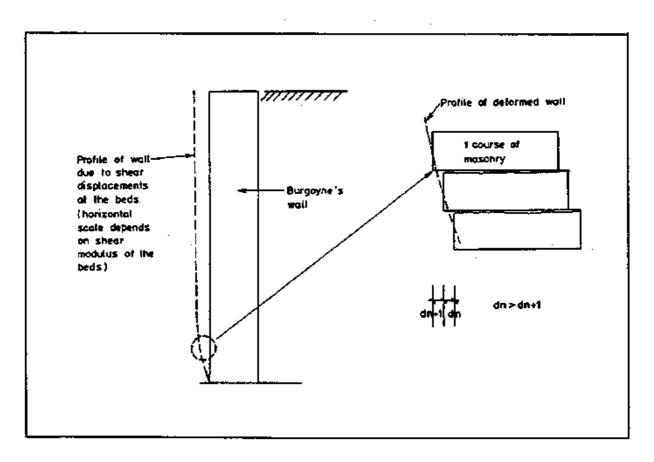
Deformation of Masonry Retaining Wall due to Shear Displacement at the Beds
